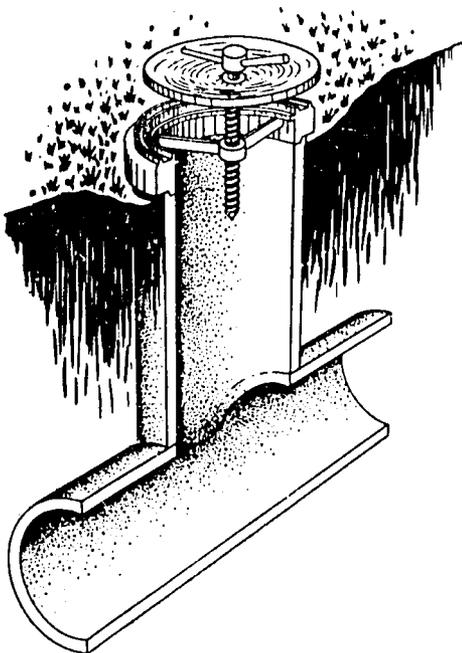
Section of a alfalfa valve mounted on concrete pipe
